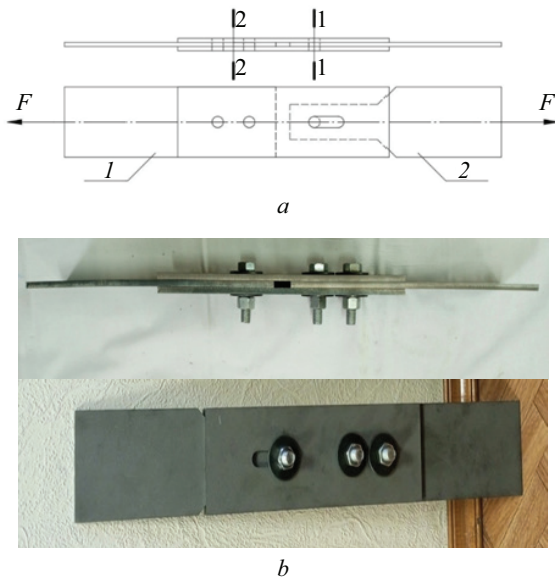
Design of the investigated butt joint of steel plates with double-sided overlays: *a* — connection scheme; *b* — general view
